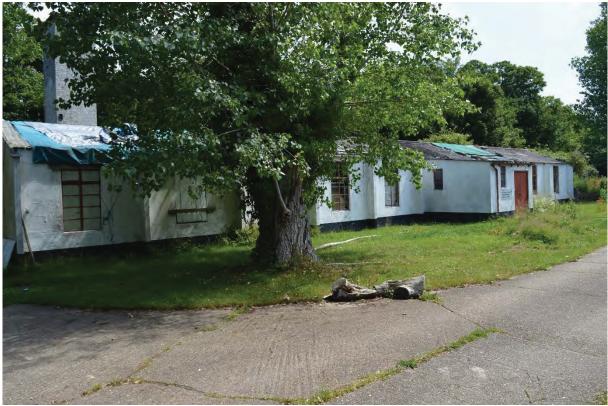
Building 1, principal elevation, showing projecting entrance (1)
